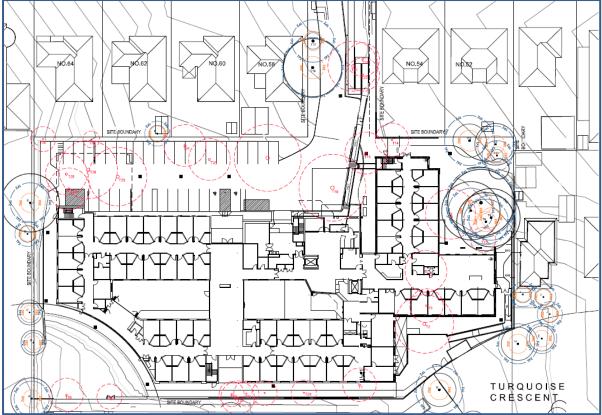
Tree Removal/Retention Plan Drawing 06 Rev C
